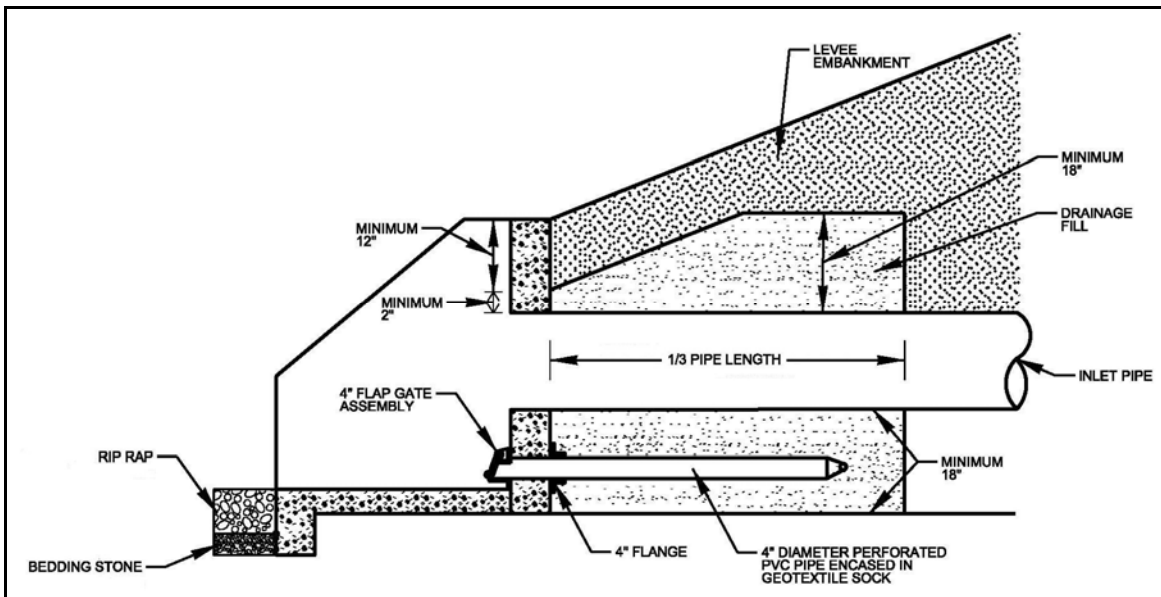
Typical construction details of drainage fill interface with headwall/wingwall.
